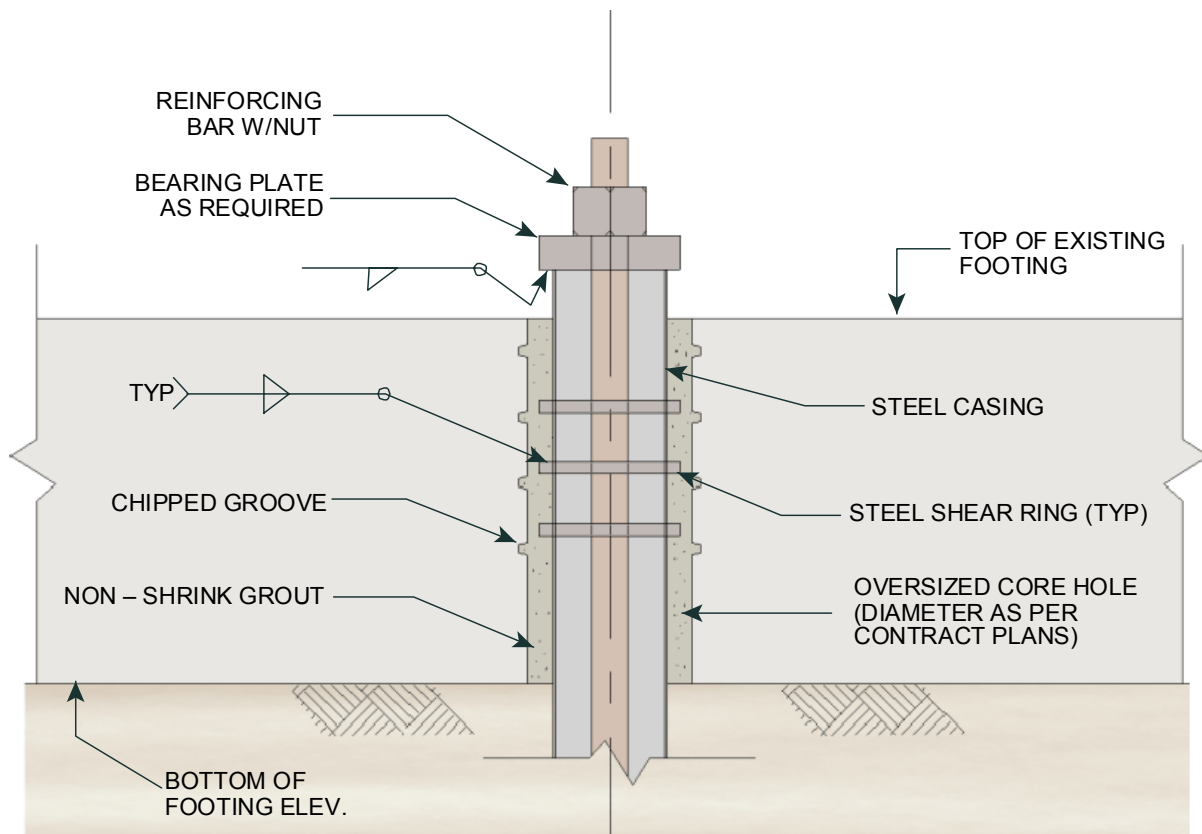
Pile to Footing Connection (compression and tension loads).
